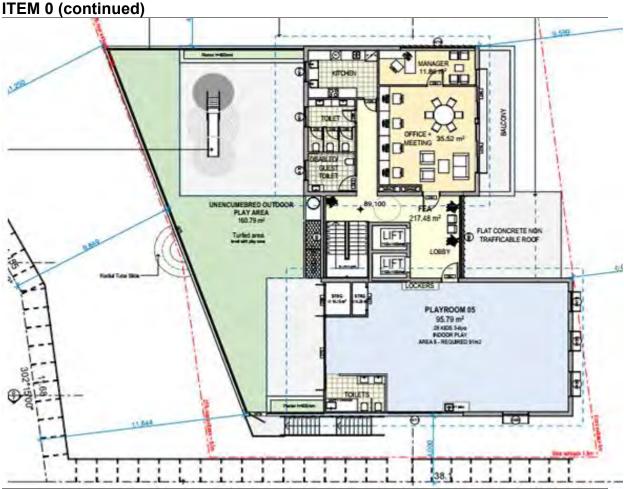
Extract of proposed first floor plan. Source: Designcorp Architects, 25 June 2020
